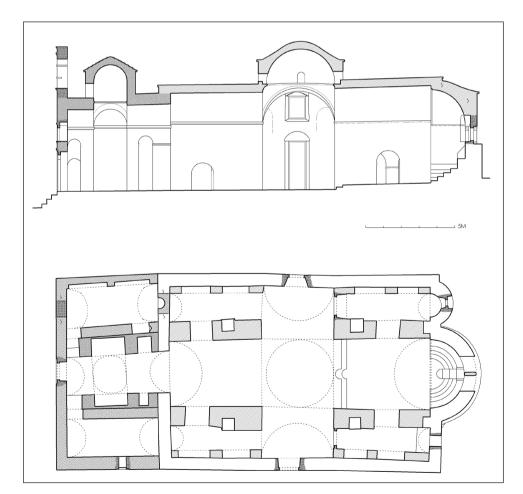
Protothronos in Chalki. Plan and longitudinal section.
